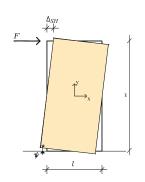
Sheathing-to-framing connections contribution (from [37]).
